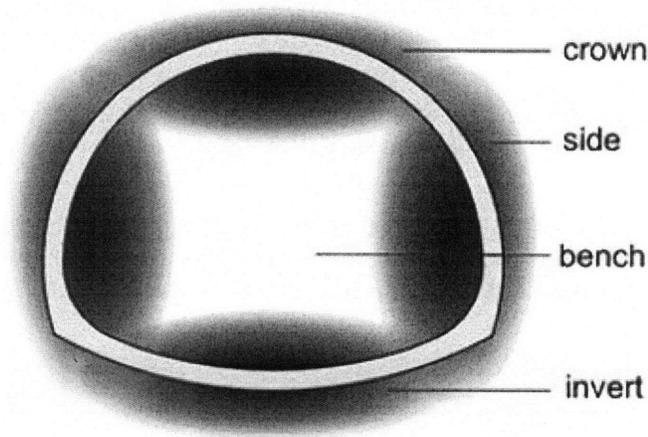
, Elements of a Tunnel Cross Section, (Kolymbas 2005)
